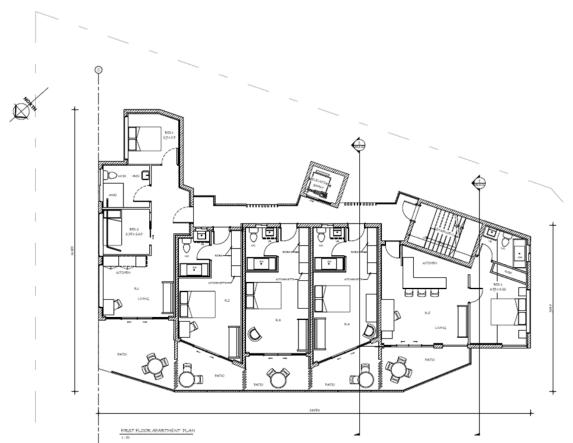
Proposed Apartment First Floor Plan (4 hotel rooms and 1 apartment rooms)
